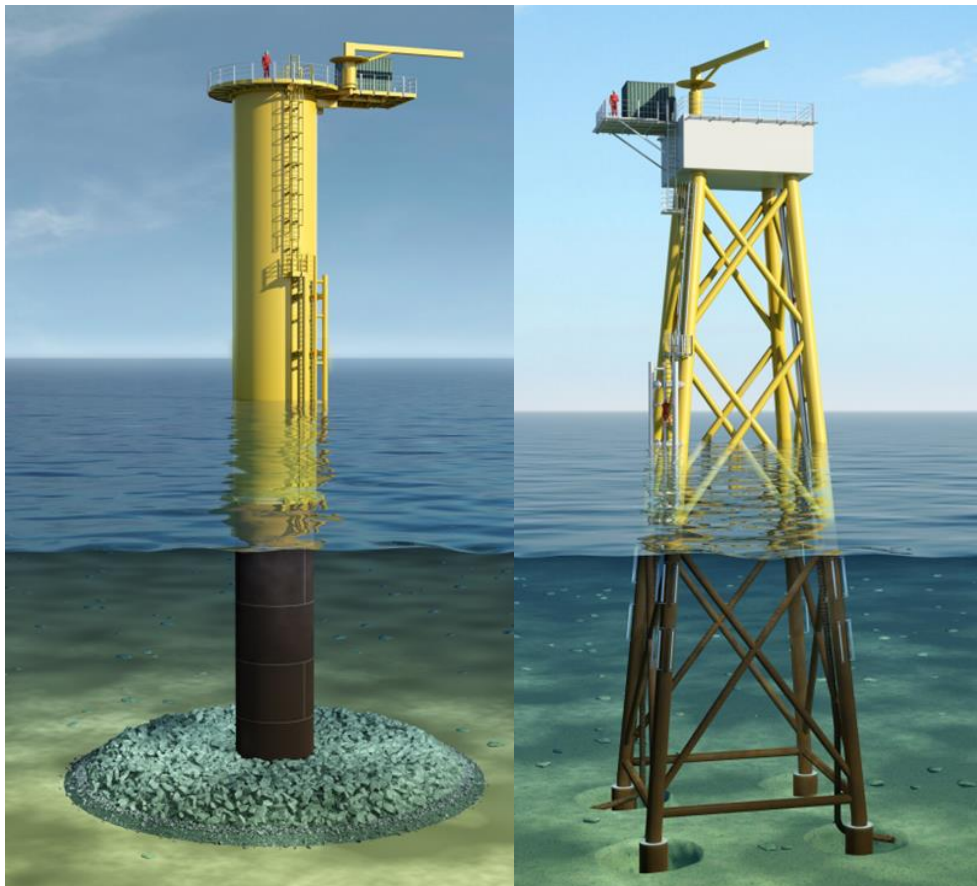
Example of possible foundations for the wind power plant: Monopile foundation with erosion protection on left, jacket foundation on right (Illustration: Ramboll).
